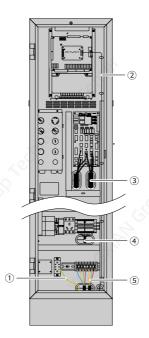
Wiring of external interfaces in the MRL control cabinet
